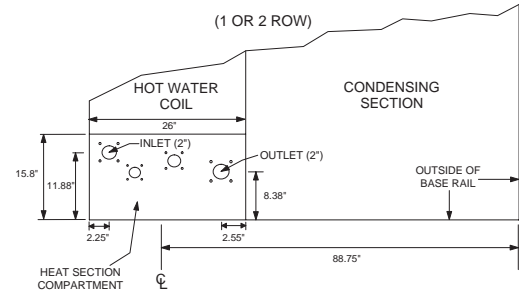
HOT WATER PIPING CROSS-SECTION
